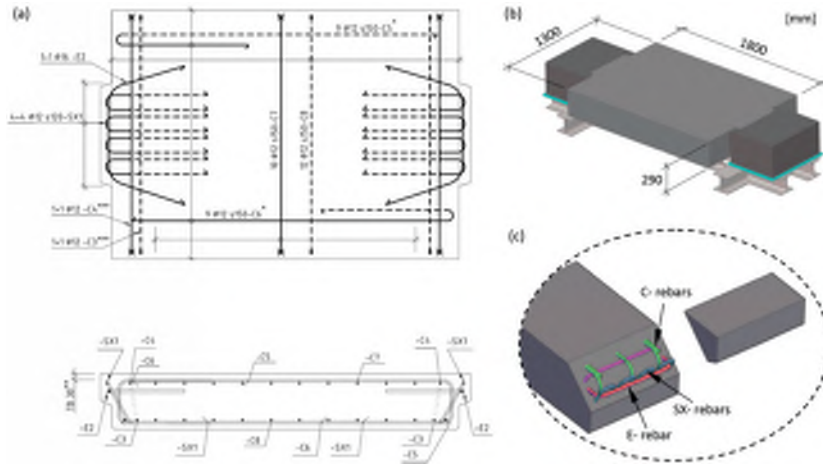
General geometry of the test specimens and reinforcement layout for specimen Type 1
